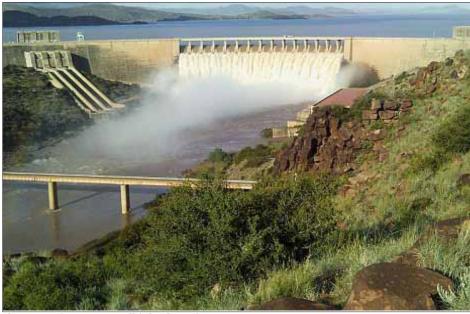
Gariep Dam Wall (Aliwal. 2011)
